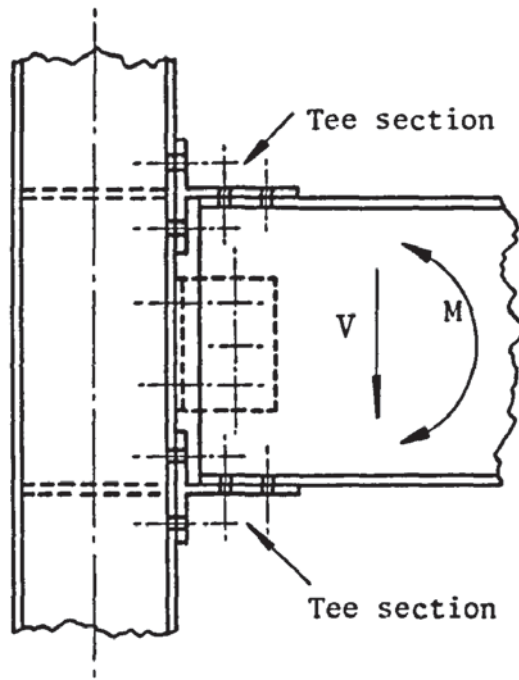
TYPICAL BEAM TO COLUMN TEE SECTION CONNECTION
